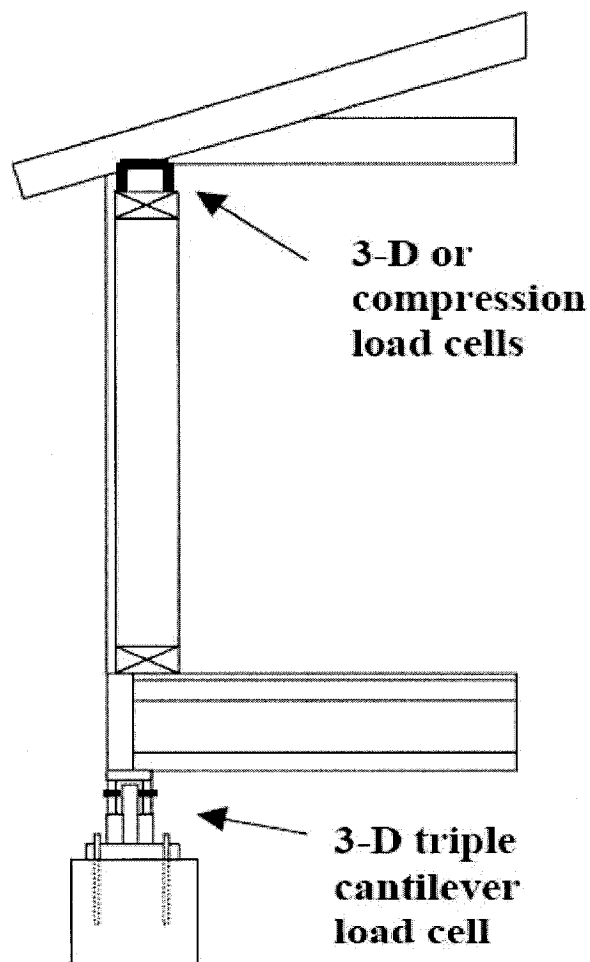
Wall cross-section and load cell installation detail (after Doudak 2005)
